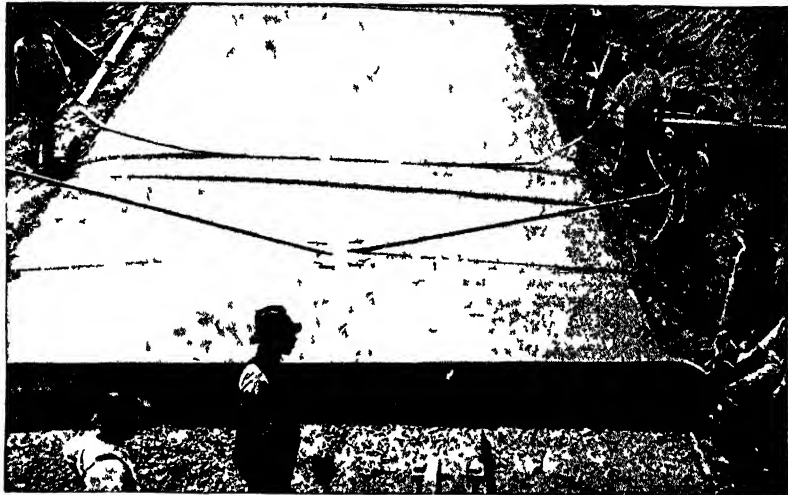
821 —Finishing concrete pavements 7. Proper sequence of striking off, floating and belting.
